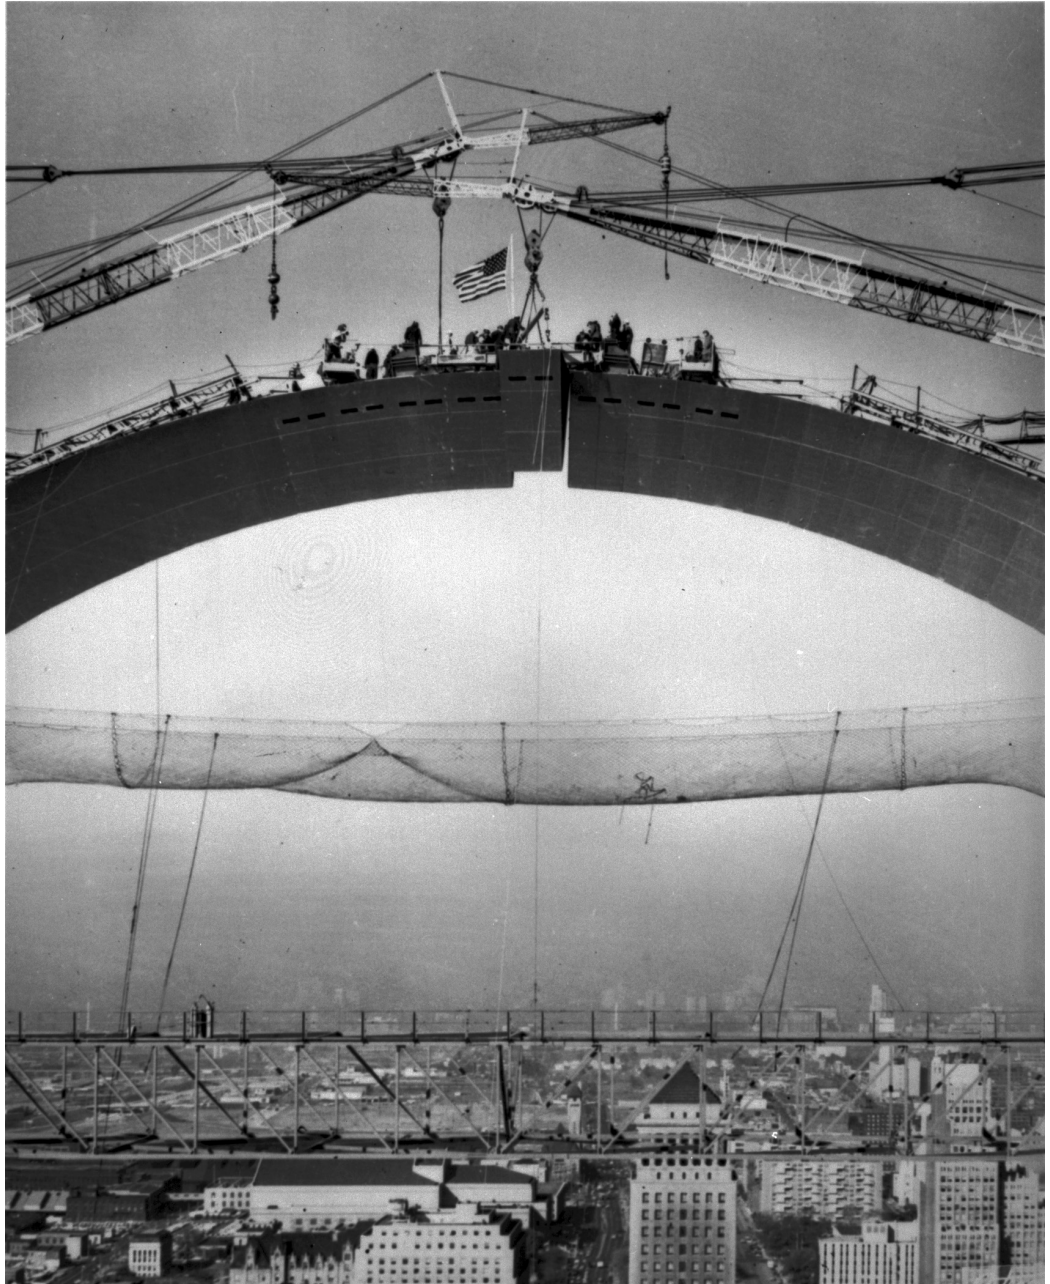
The final section of Gateway Arch is put in place, October 28, 1965. (Photo by Arteaga; JNEM Archives, reference photograph collection)
